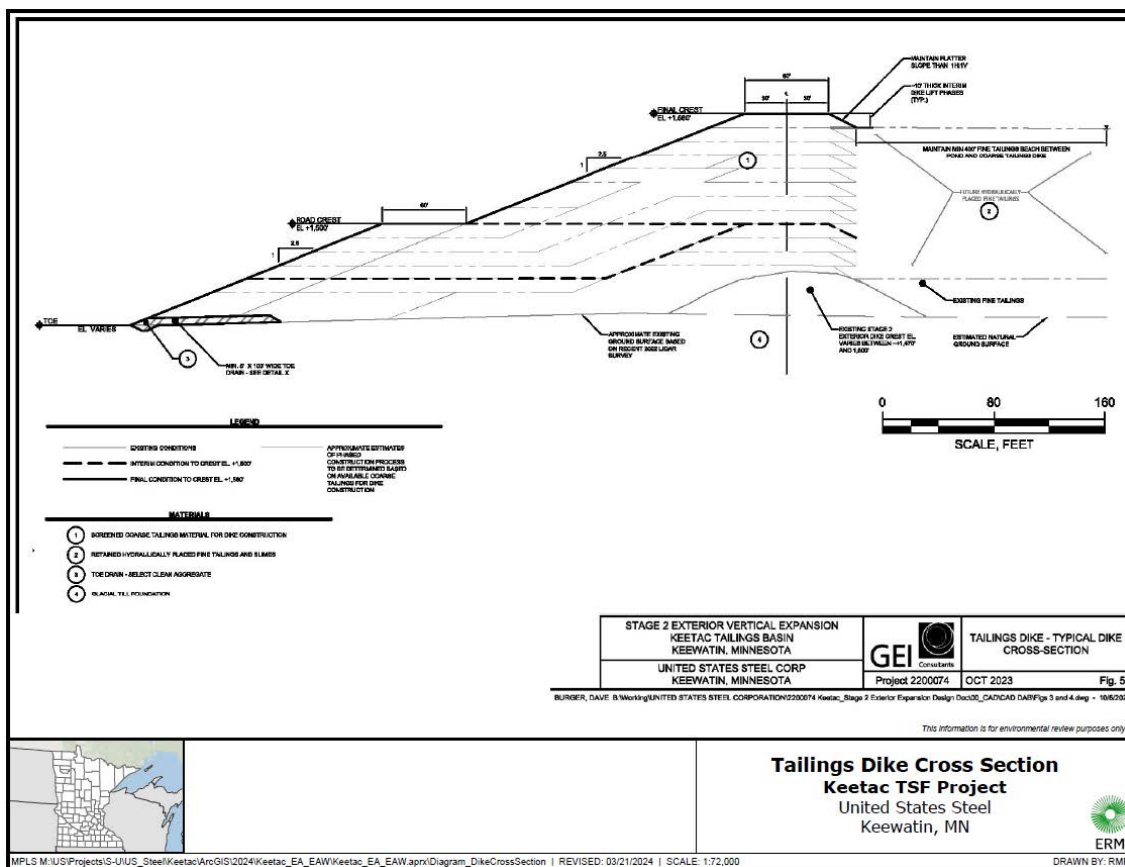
TAILINGS DIKE TYPICAL CROSS SECTION—MODIFIED CENTERLINE CONSTRUCTION
